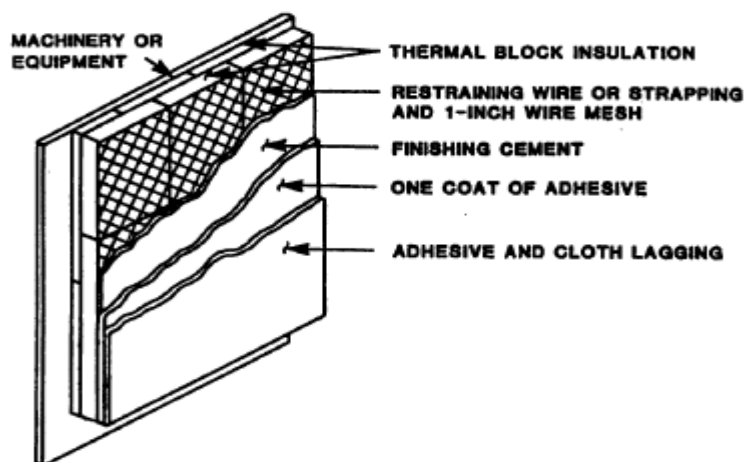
Application of thermal block insulation conforming to MIL-PRF-2819, class 2, to machinery and equipment (temperature range 125 to 1200 °F).
